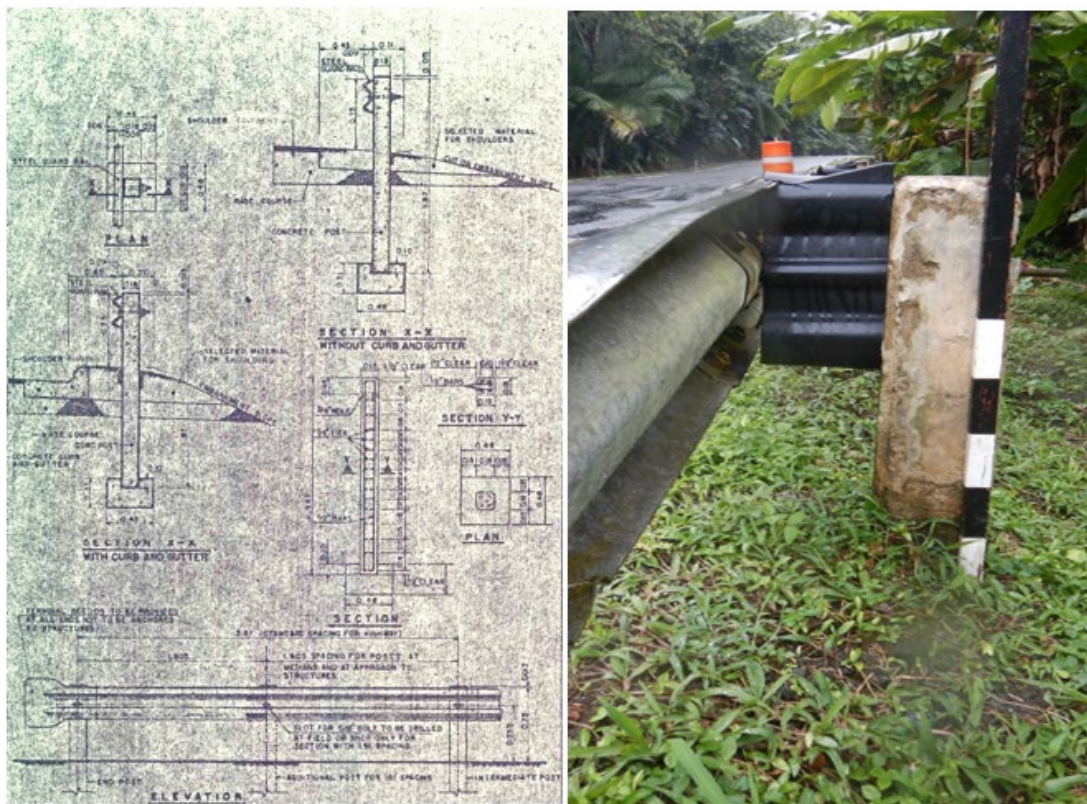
Guardrail details on 1966 plans; guardrail section in PR9966.
